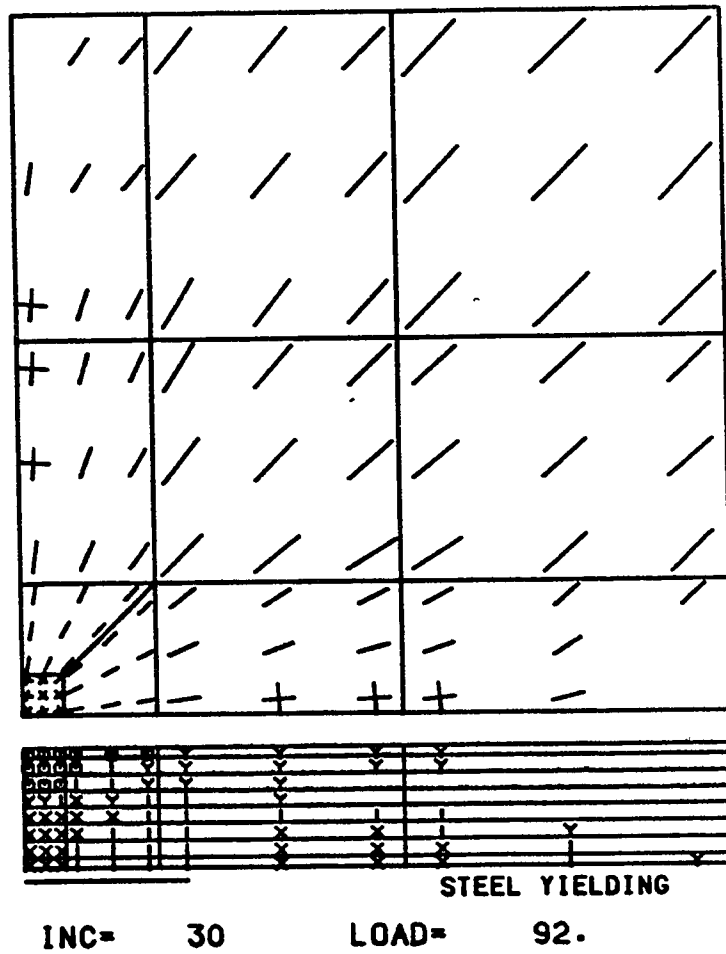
Cracking in bottom of slab and section profile at collapse load
